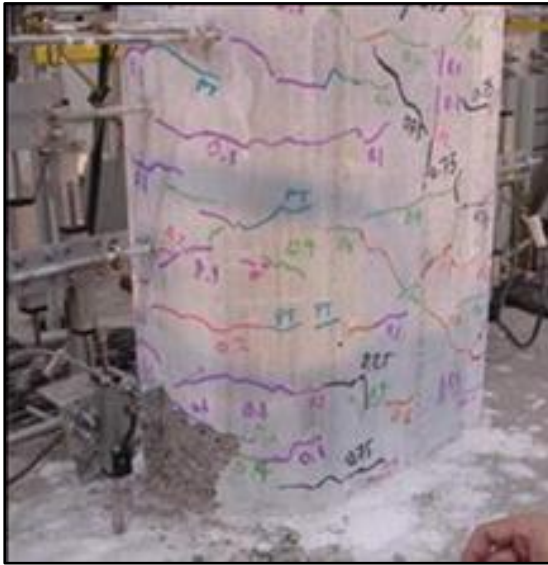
DS-3 Extensive Cracking and Spalling
